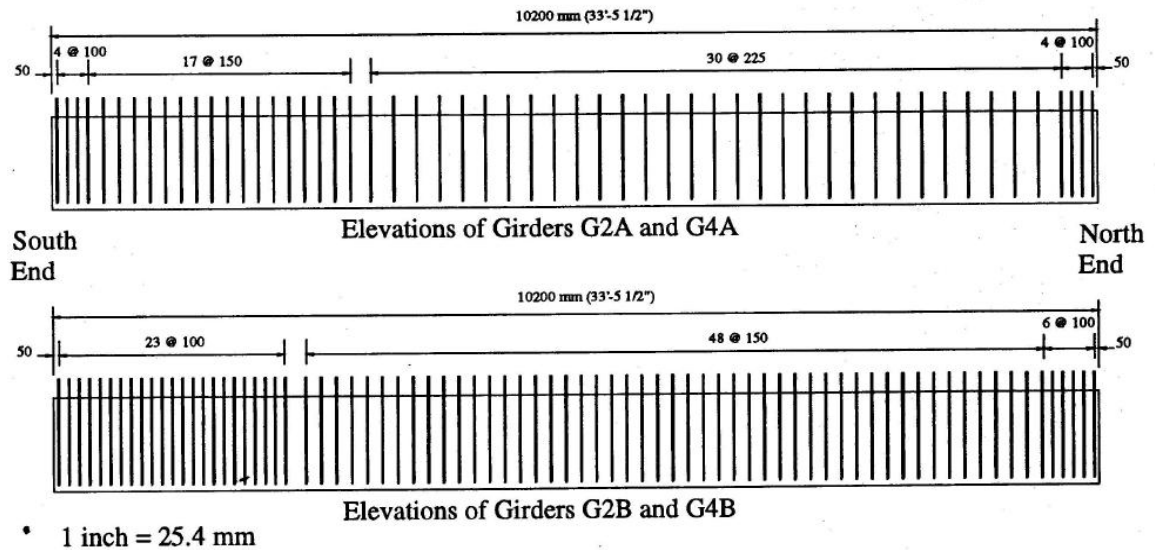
Typical shear stirrup spacing in Type II girders (Dill and Kahn, 2000), dimensions in millimeters
